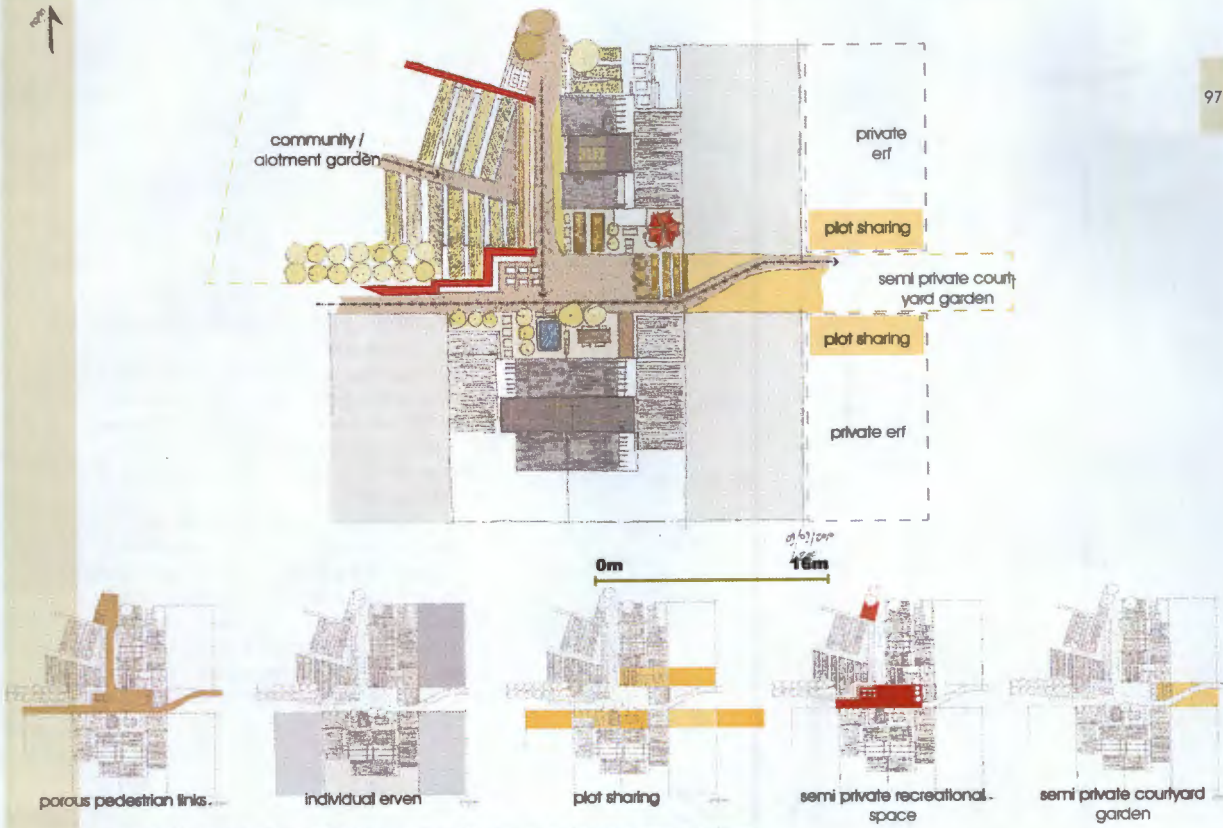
Site plan: Semi-Private courtyard/ backyard alley (image by author 2010)
